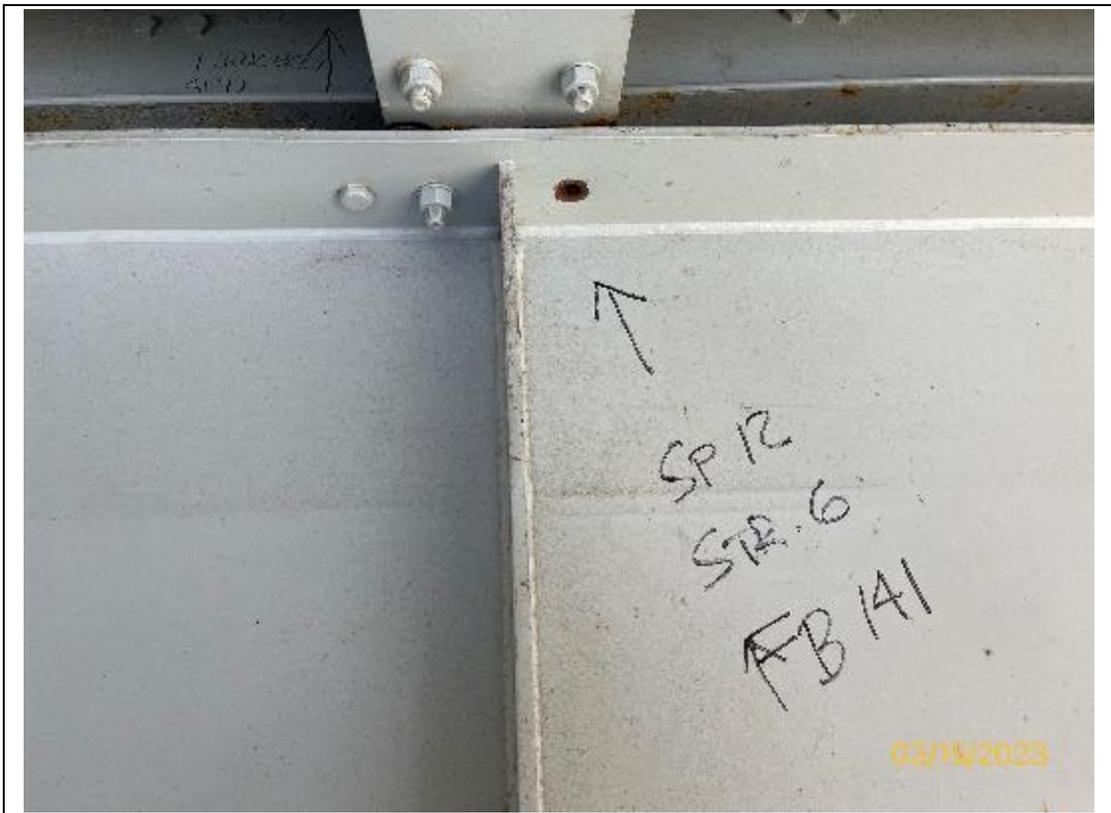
(Note: Photo mislabeled, this is Stringer 5.)
